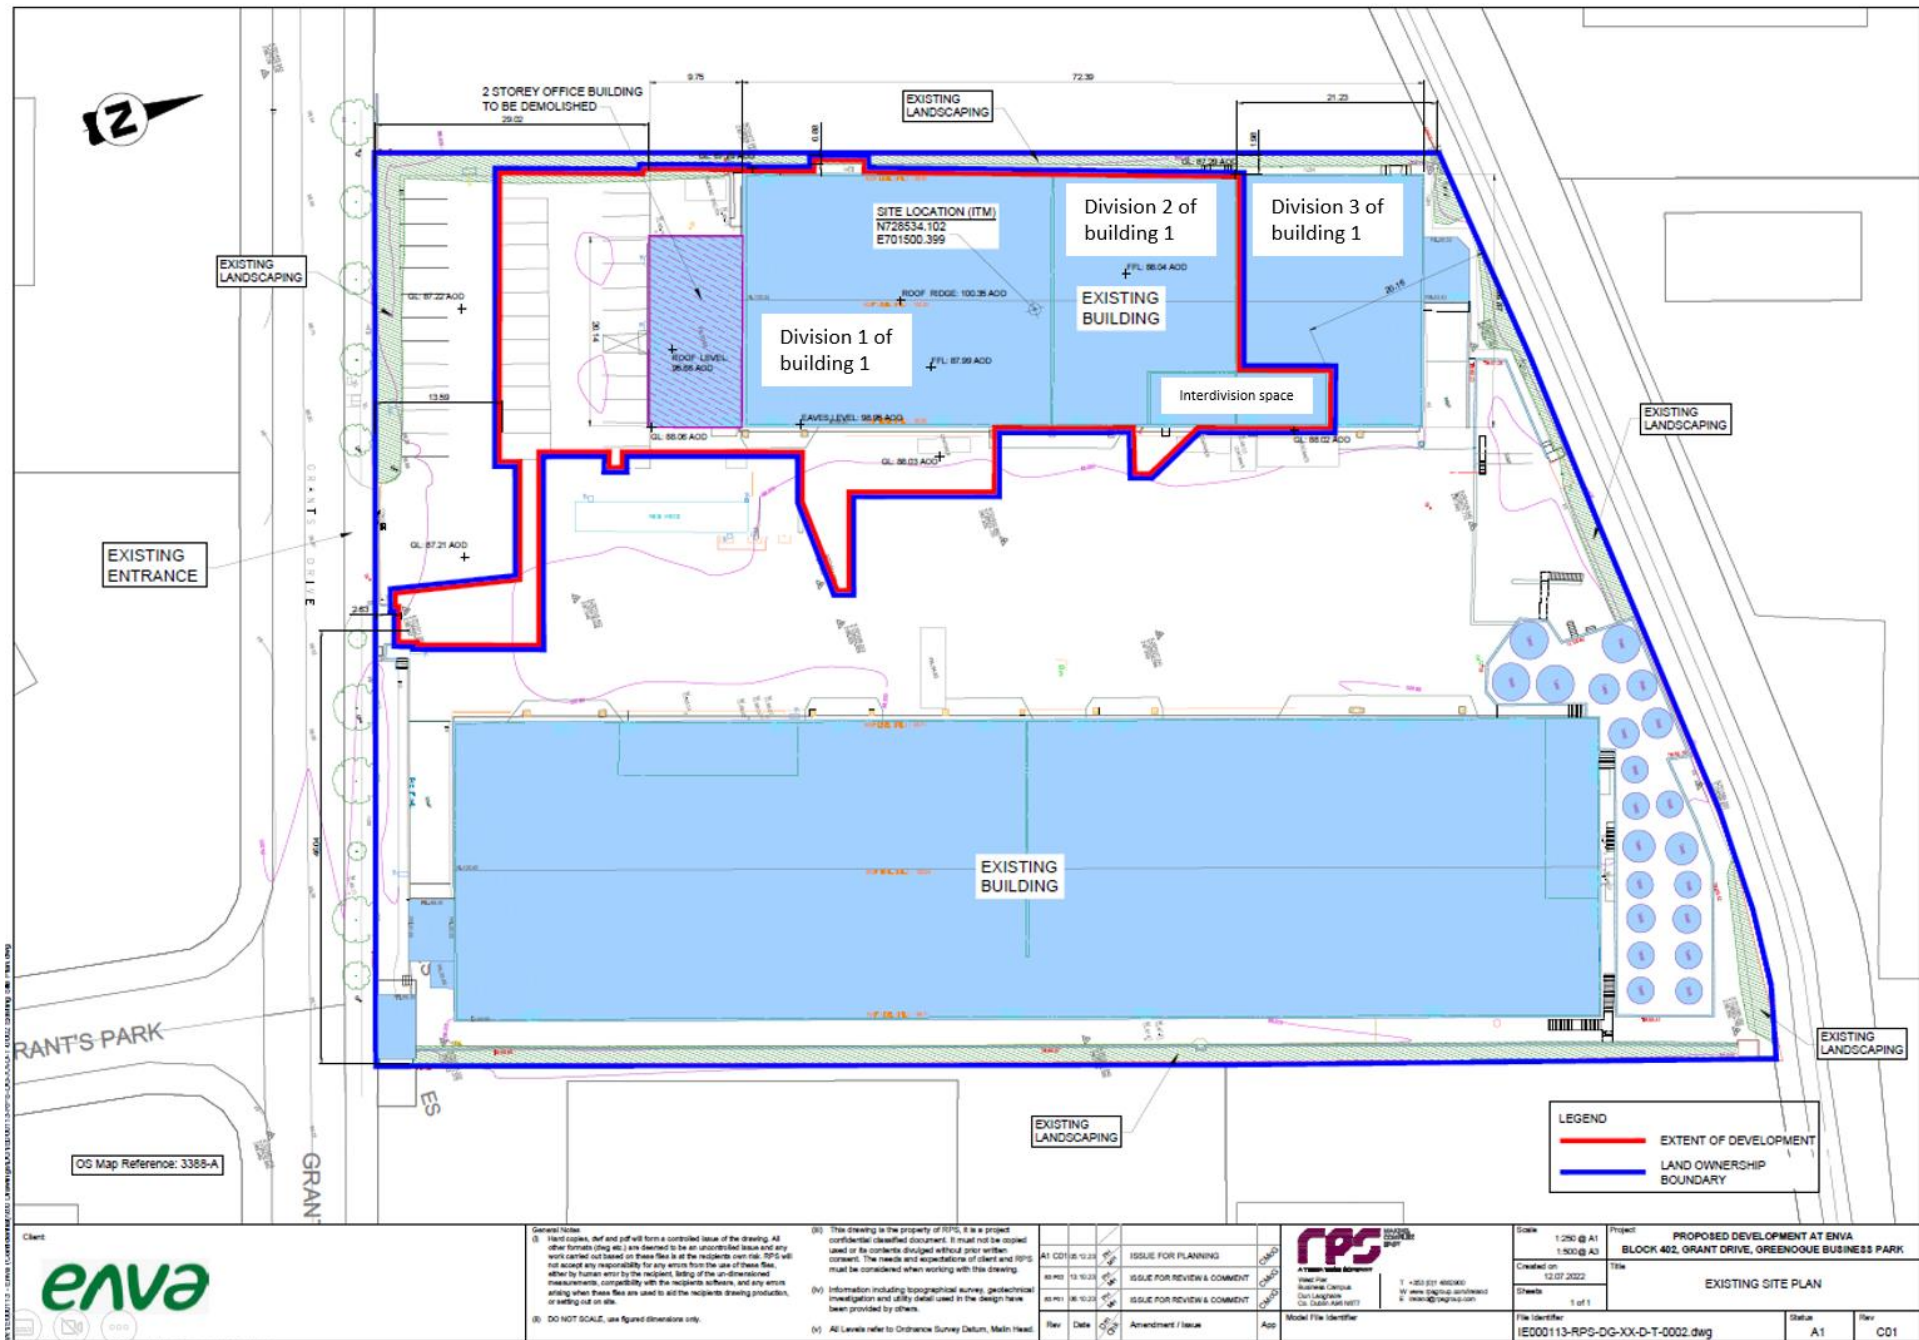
Existing Site Layout Showing Building 1 Subdivisions
